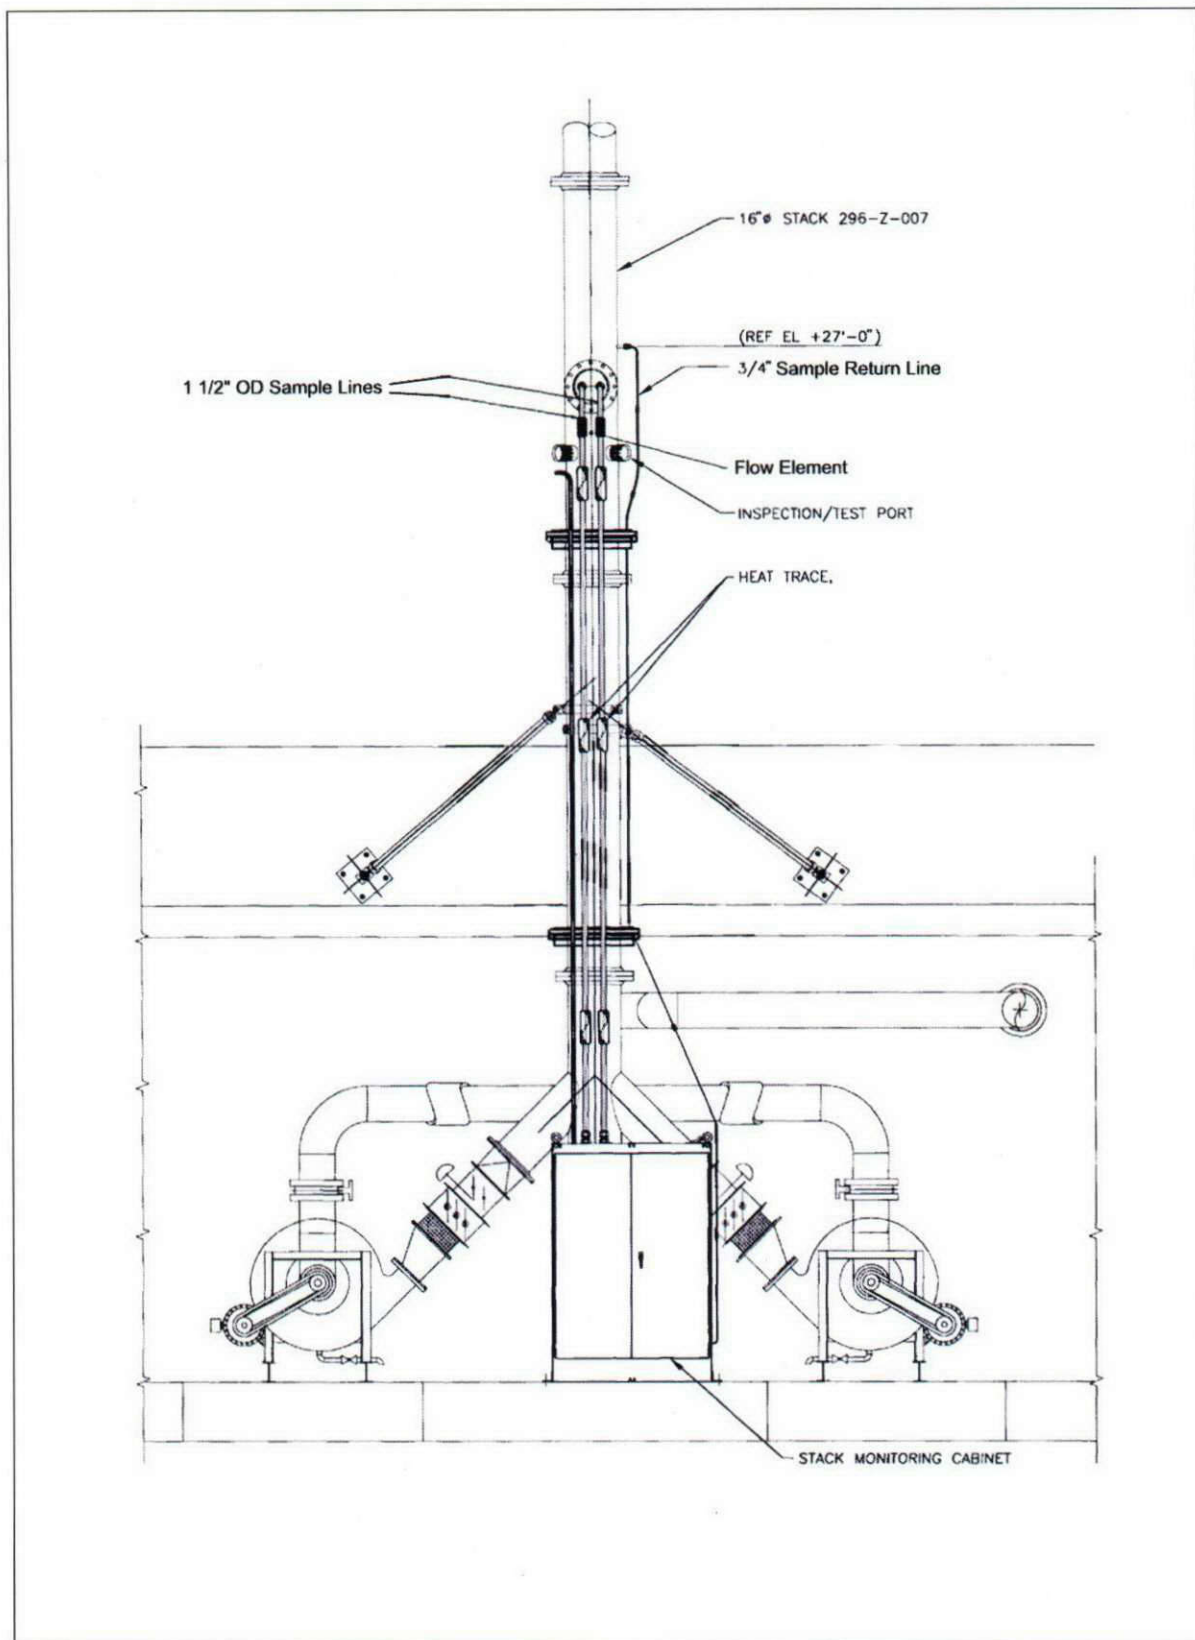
296-Z-7 Ventilation Exhaust Stack.
